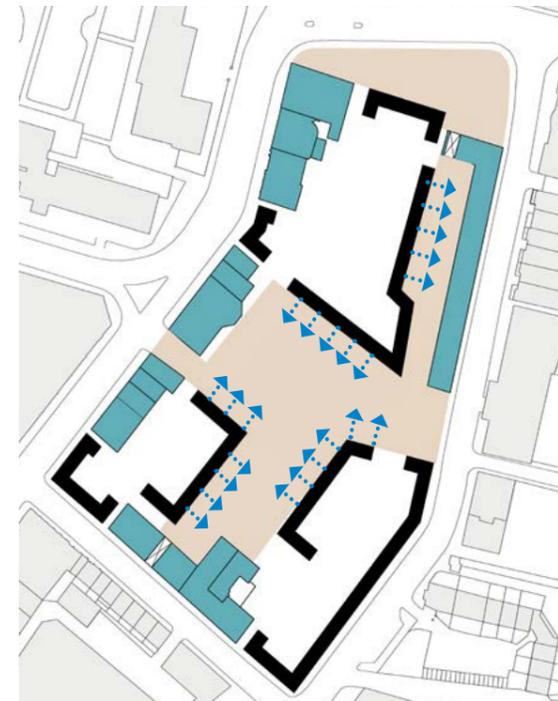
New buildings will provide overlooking to the new public square whilst establishing a new interior edge.
